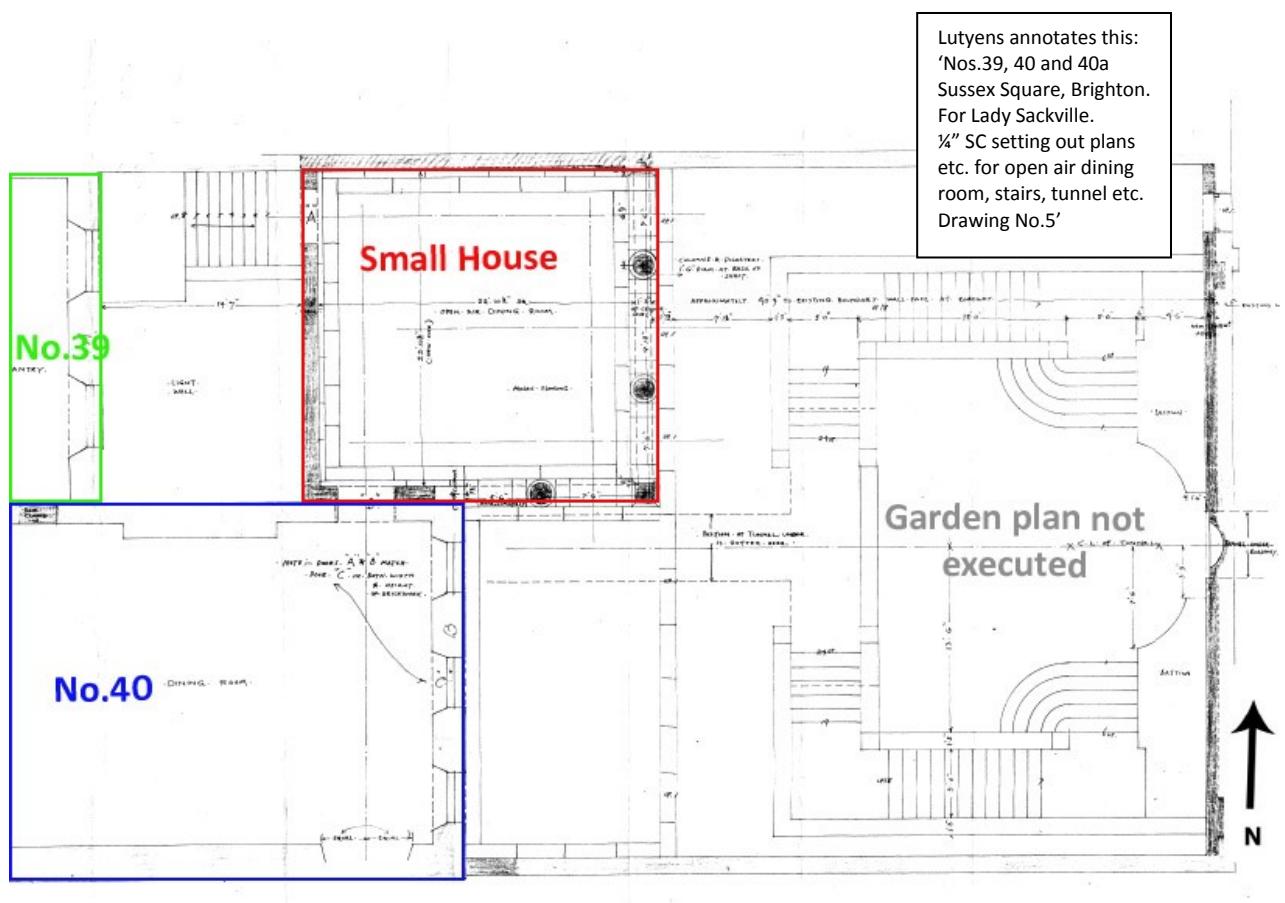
Lutyens setting out plans for The Small House and garden, 1918.
